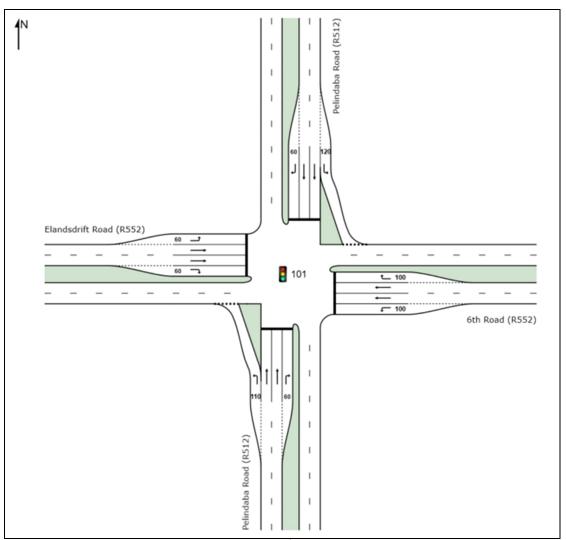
Pelindaba Road (R512) and 6th Road (R552) – Schematic Layout of Existing Intersection Geometry, Signalised.
